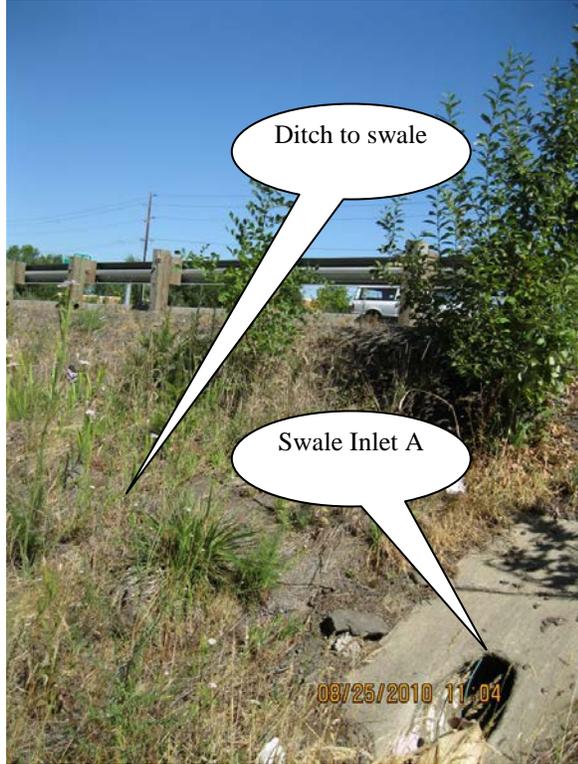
Swale Inlet A at start of swale. Photograph is looking towards the north at US26 (Hwy 047).
